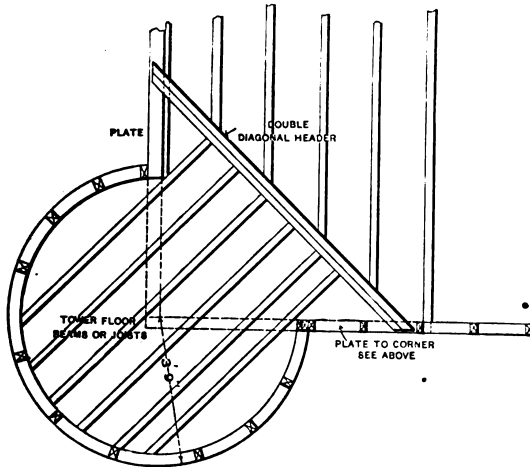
Plan of Tower Framing.—Scale, 1/4 Inch to the Foot.
